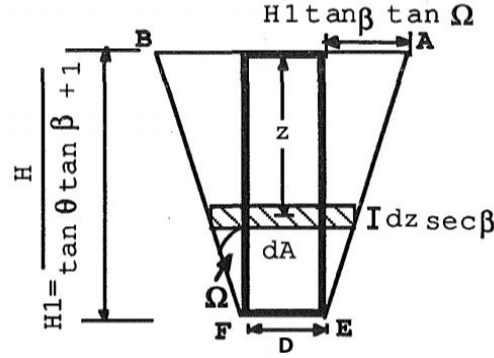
Elevation view of inclined plane EABF of failure wedge by Gabr and Borden [1]
